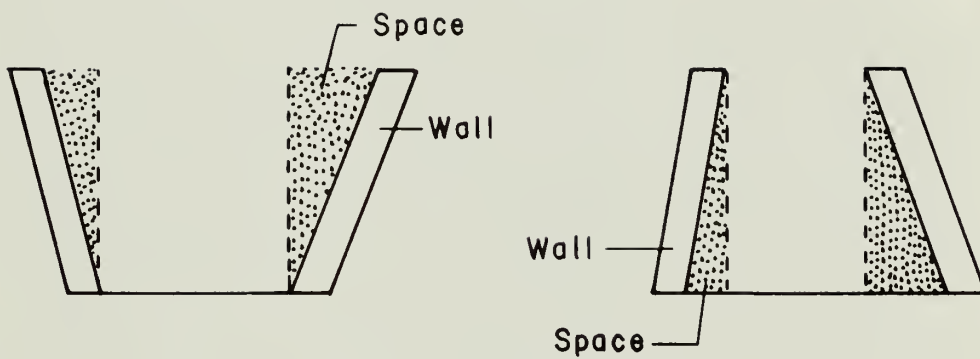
An illustration of the space created by the irregularities in wall construction or wall slope.
